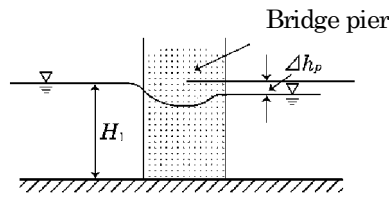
Amount of drawdown in water level due to bridge piers
